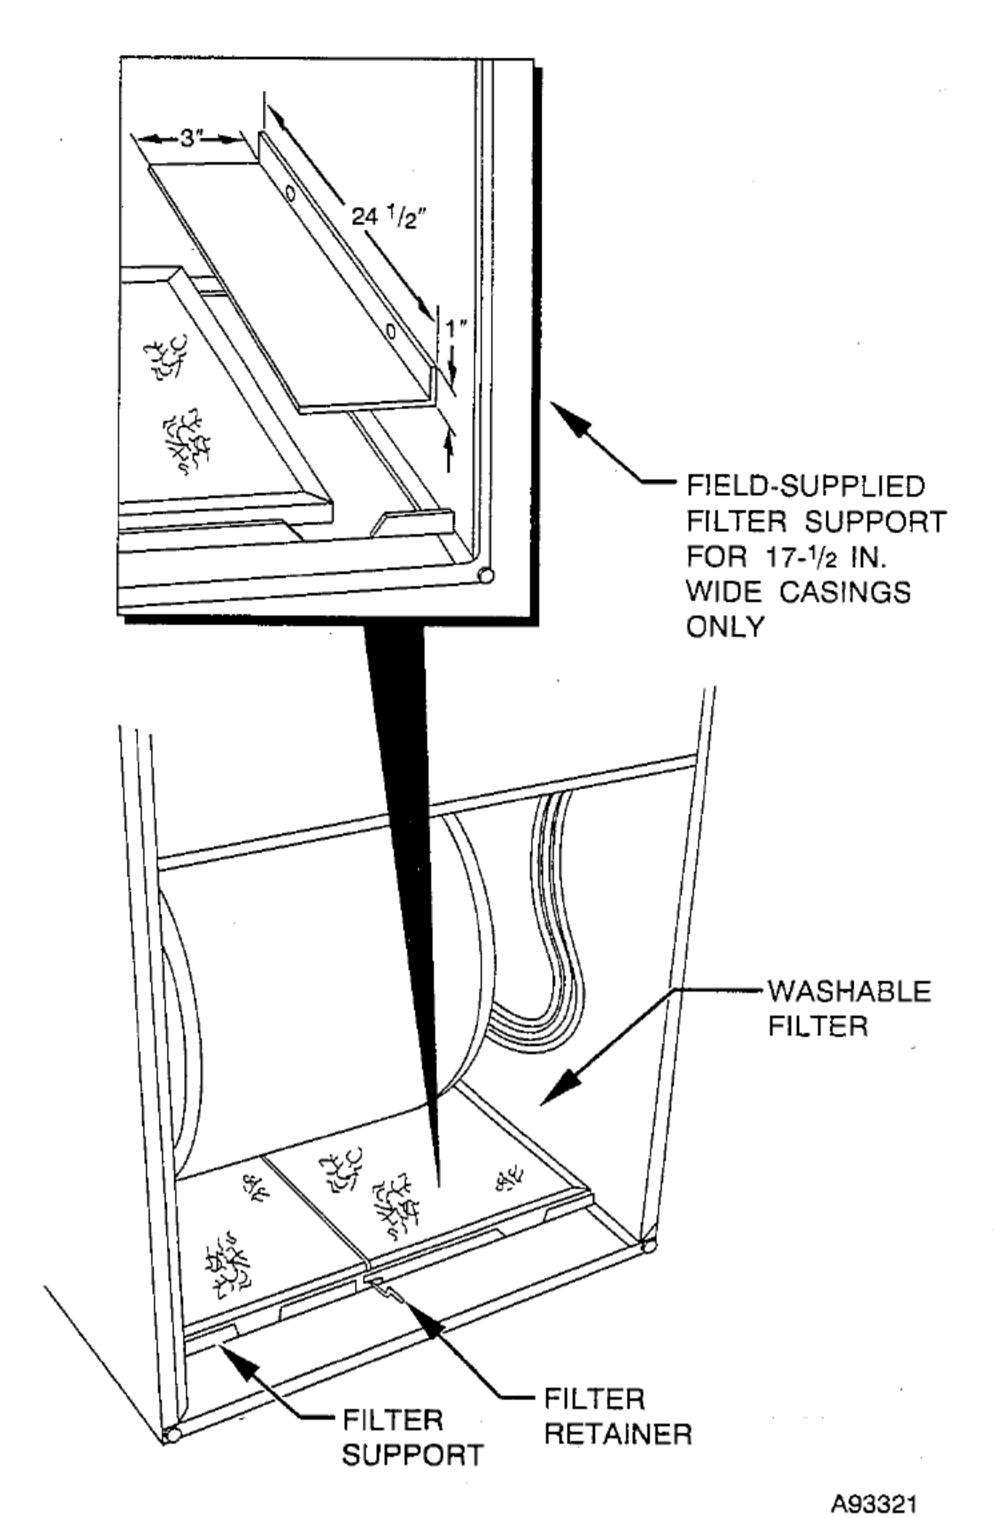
Bottom Filter Arrangement (Control Removed for Clarity)
